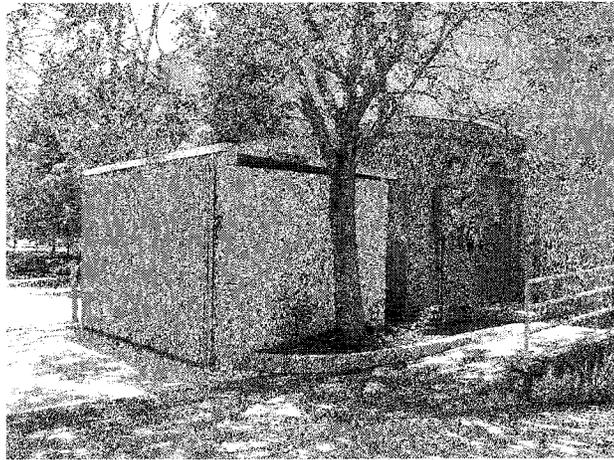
Nextel equipment shed and enclosed trash dumpster area adjacent to the east side of the site building
